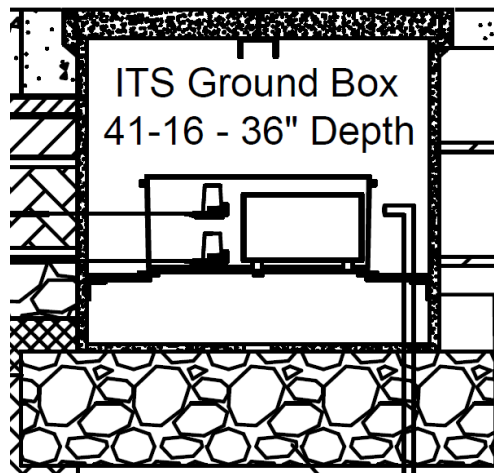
Schematic of enclosure box mounted inside the concrete box using brackets
